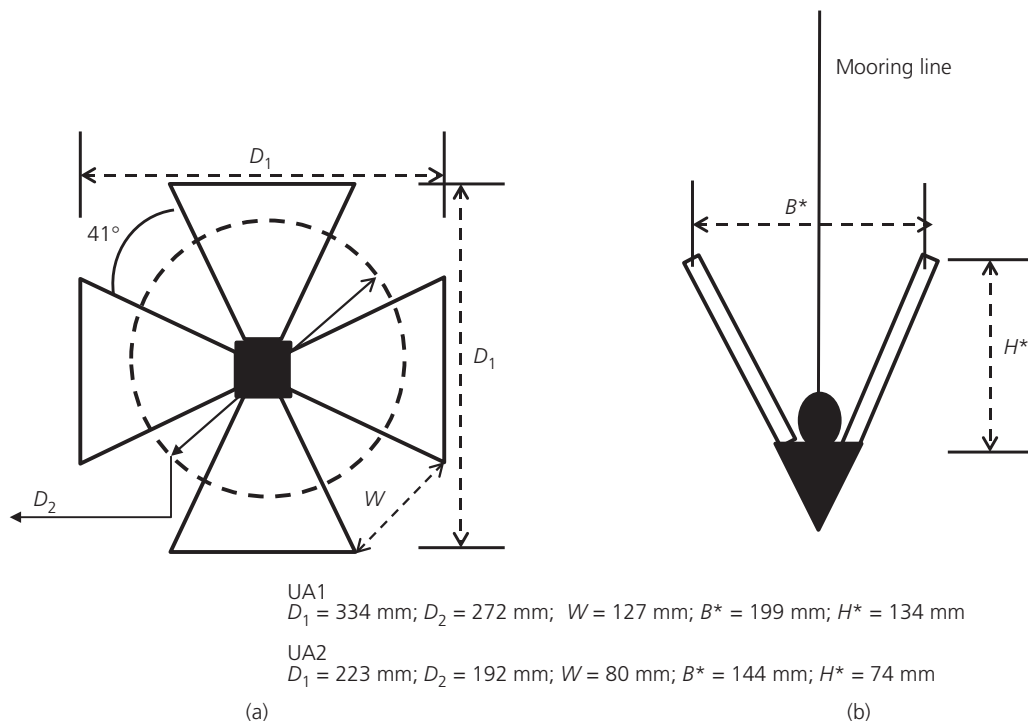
Umbrella anchors used in testing with dimensions: (a) plan view of opened anchor; (b) section of closed anchor
